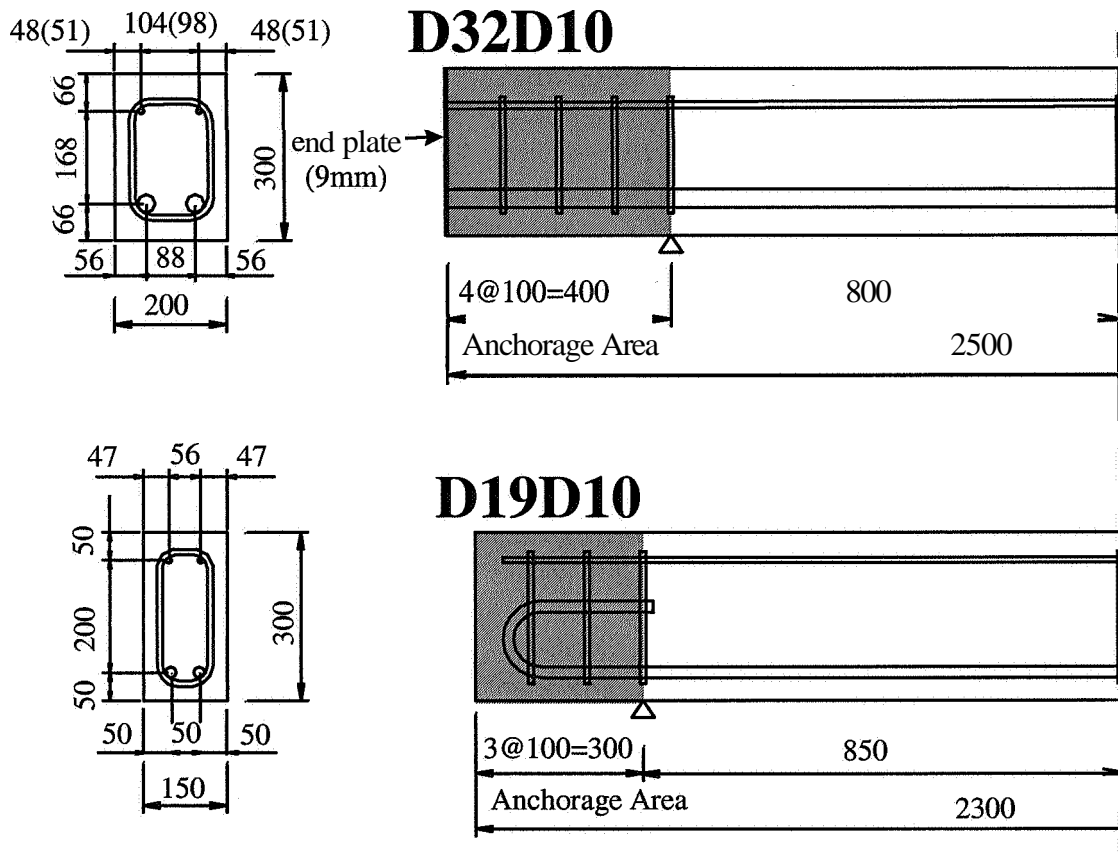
Dimensions and configuration of steel bars of beam specimen.
